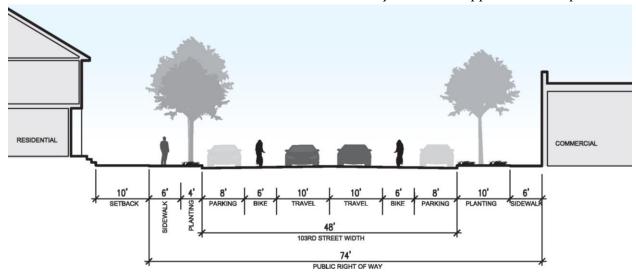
Typical street section along 103rd Street on the 400 West block between Eggleston Avenue and Normal Avenue
